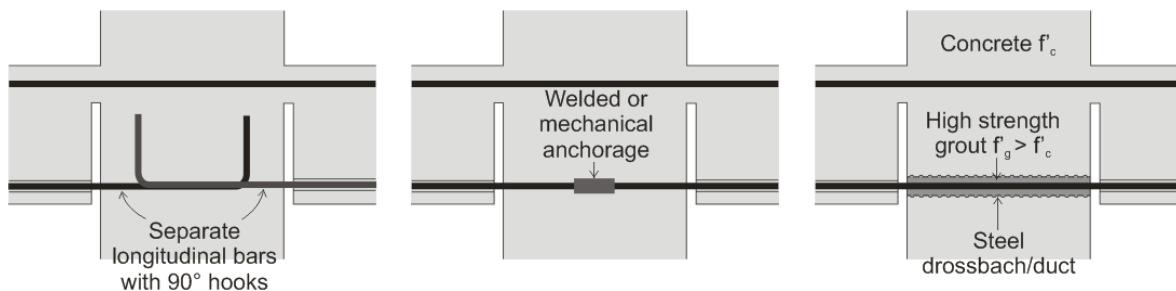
Alternative anchorage details for bottom reinforcement in interior joints
